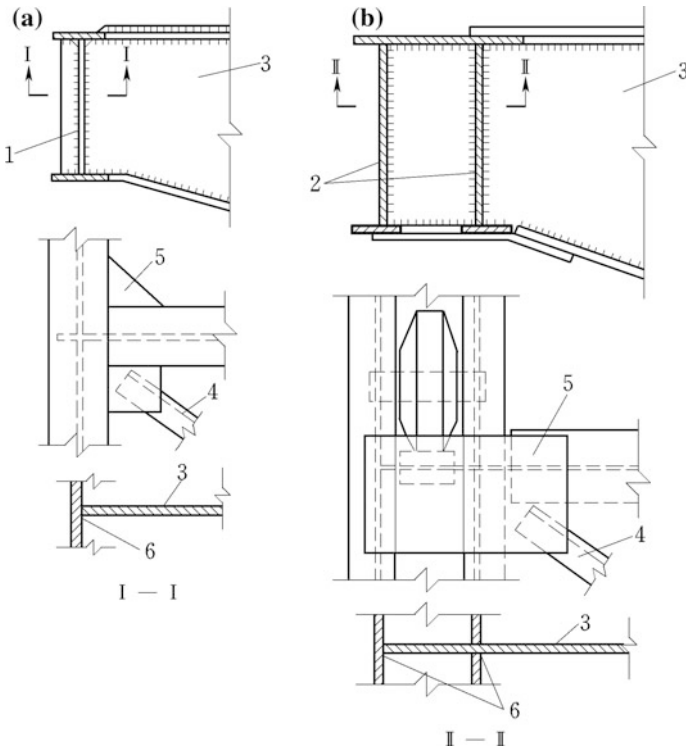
Types of support beams. a Single-walled support beam; b double-walled support beam. 1 single-walled support beam; 2 double-walled support beam; 3 crossbar web; 4 cross-tie of truss for hanger; 5 strengthened plate of node; 6 k-type welding line
